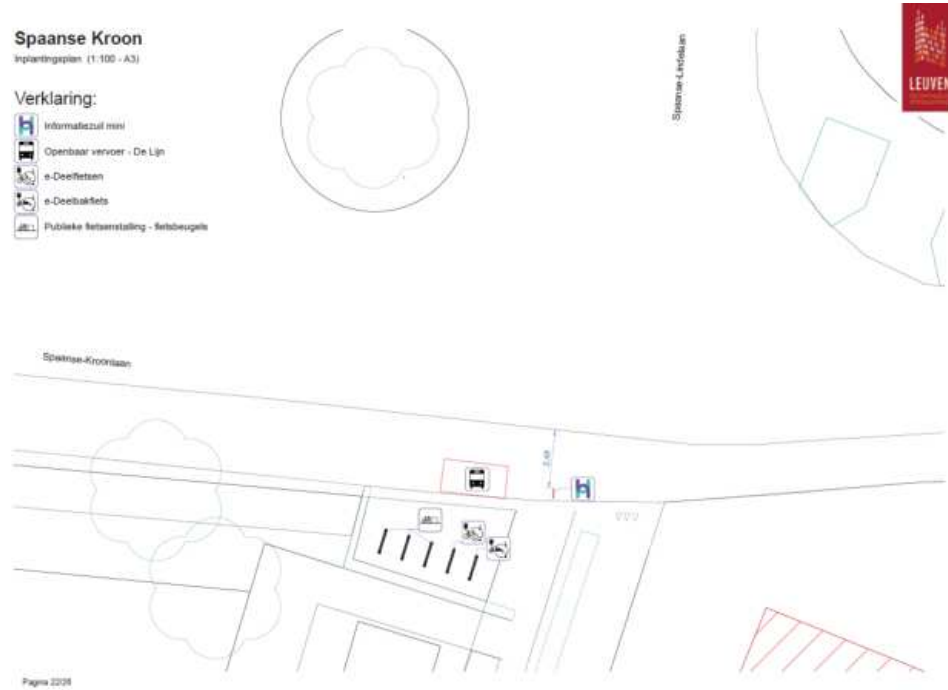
May 2021 – Site plan information pillar of eHUB Spaanse Kroon, implemented since May 2021
